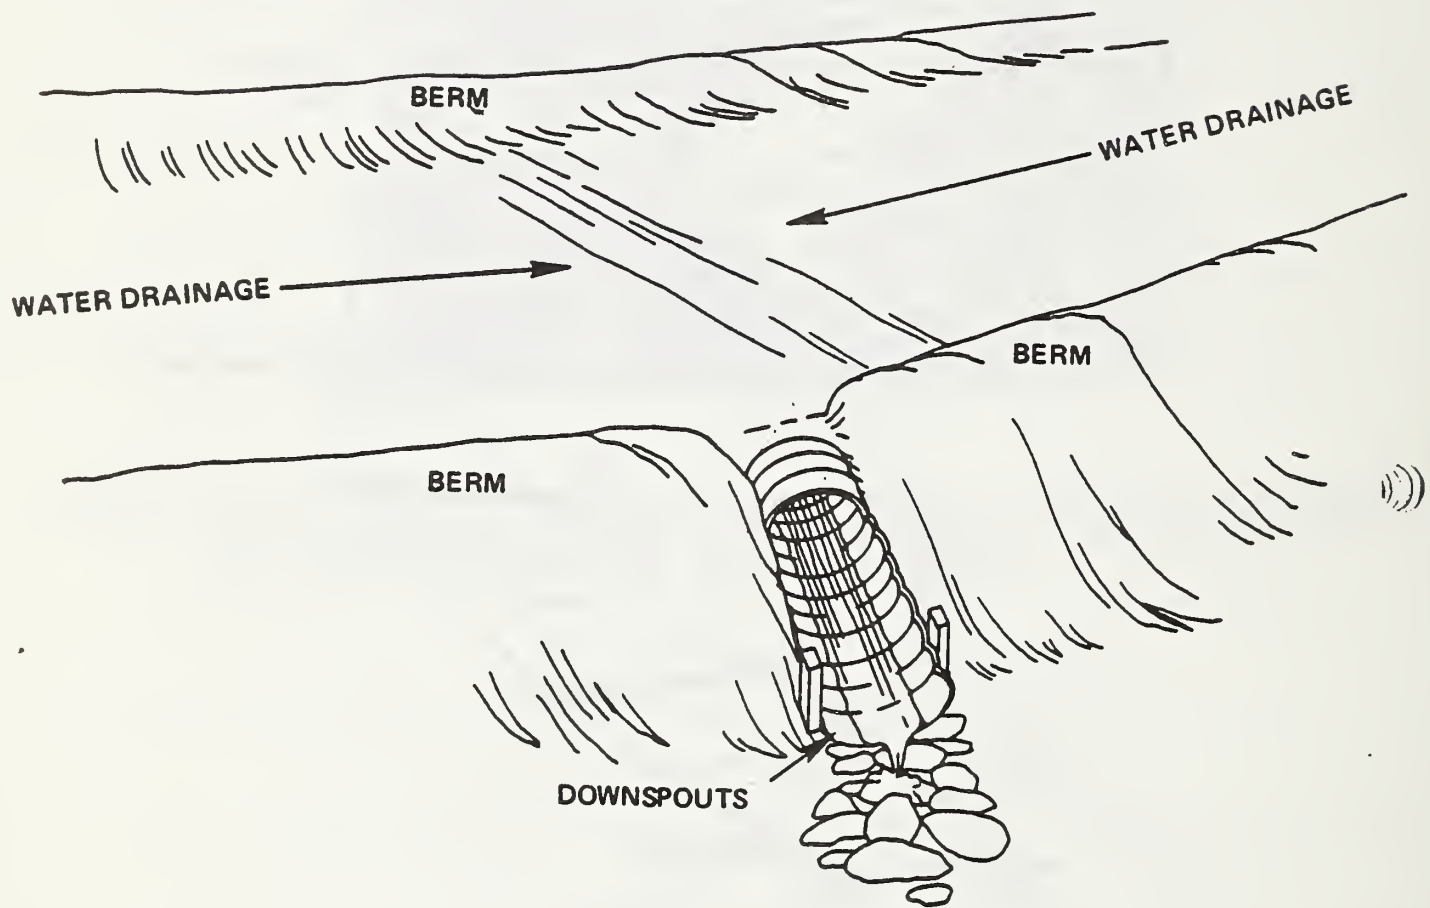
Construction of a downspout in a berm. Excess water accumulations on a berm must be drained by a downspout.
